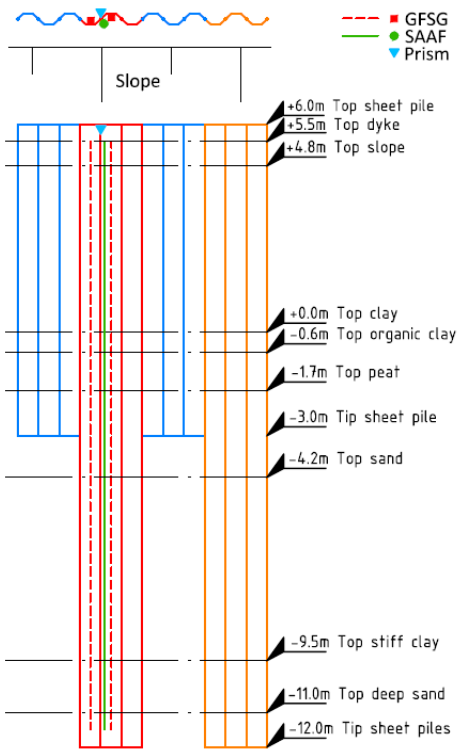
Top and side view of instrumented staggered sheet pile wall.
